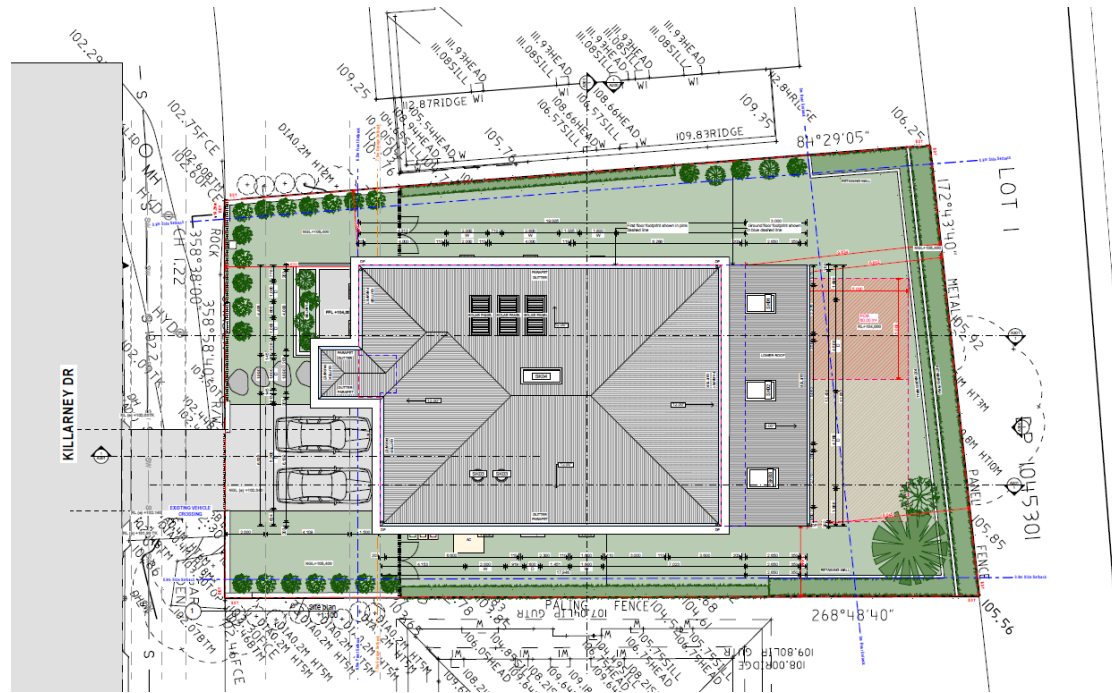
Site Plan of 46 Killarney Drive, Killarney Heights (sh. studio)
